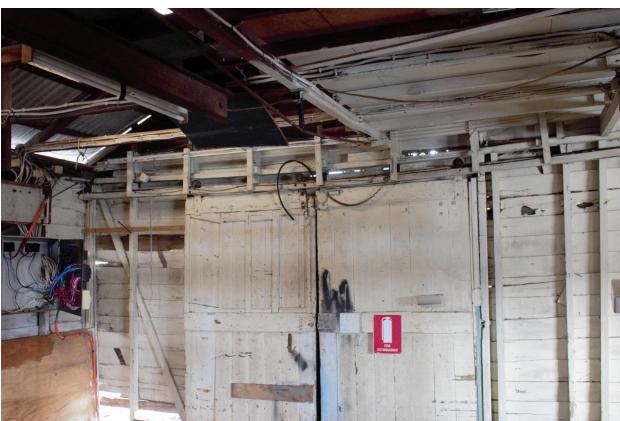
Timber barn style sliding doors – possibly original to 1925.
